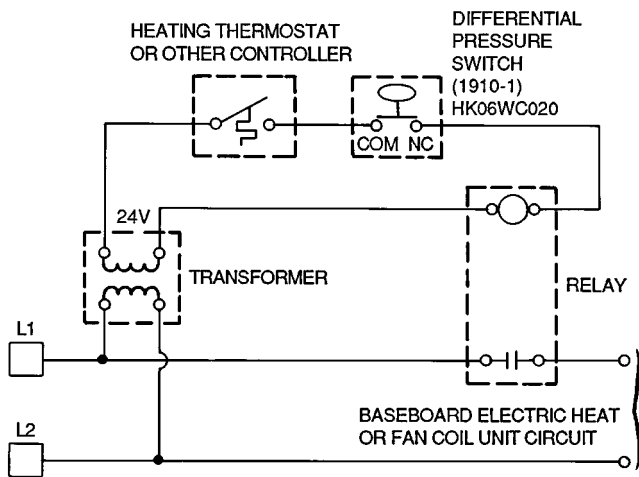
Typical Wiring for Electric Interlock with Baseboard Electric Heat
